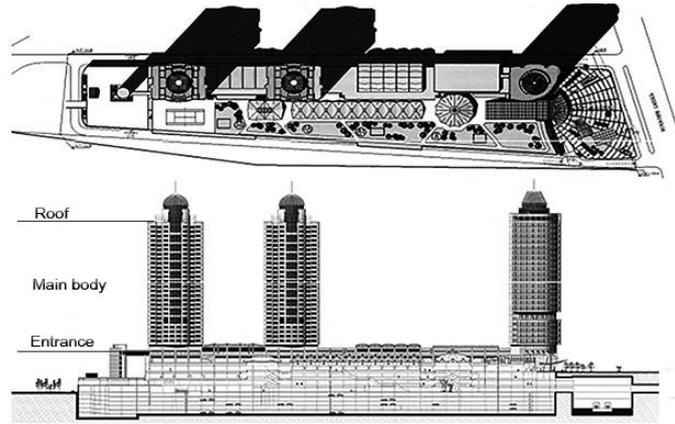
The image of Metrocity Towers, site plan and section drawing.
